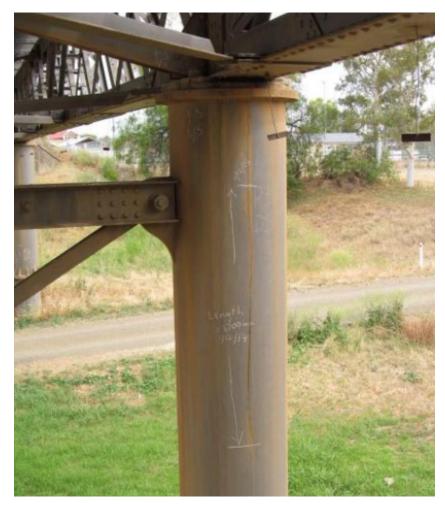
Crack in Pier 3 column (photo: C. Everett, 2017).
